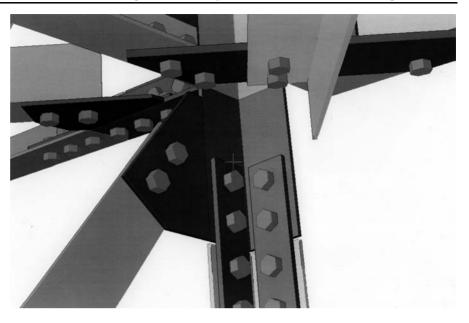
Solid modelling of steel joints (Strucad, Derby, UK)
